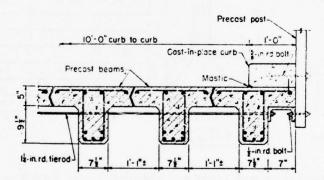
T-shaped precast units for bridge deck (courtesy of Portland Cement Association)
